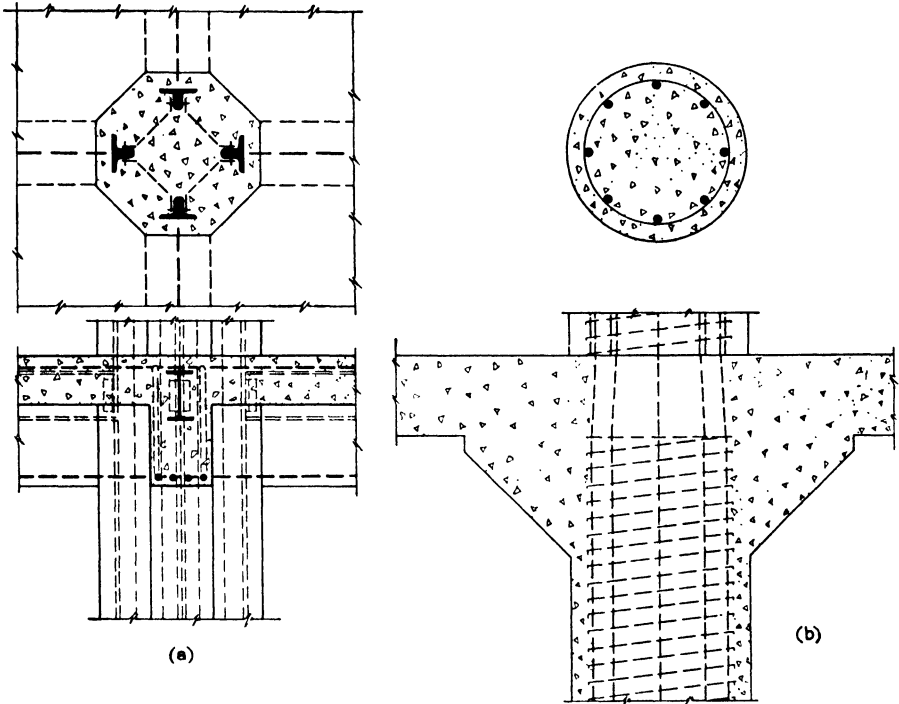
Reinforced Concrete Columns. (a) structural steel reinforcement; (b) vertical steel and spirals.
